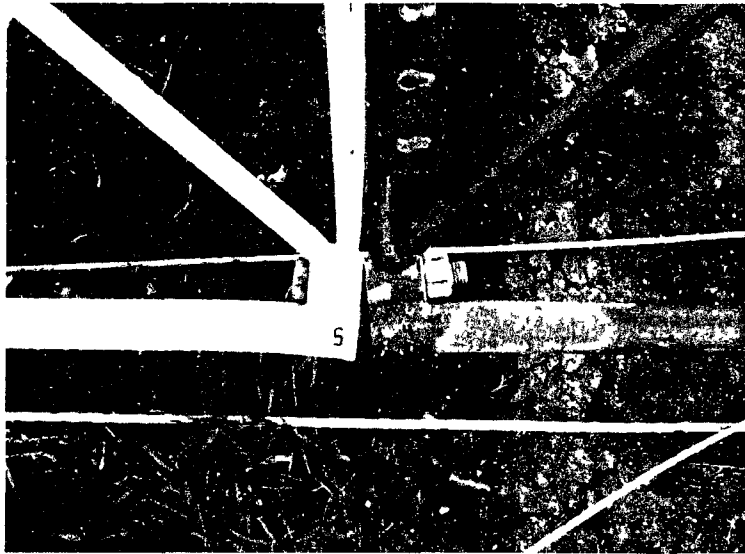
Failure of Bolted Ring-type Splice Connection
